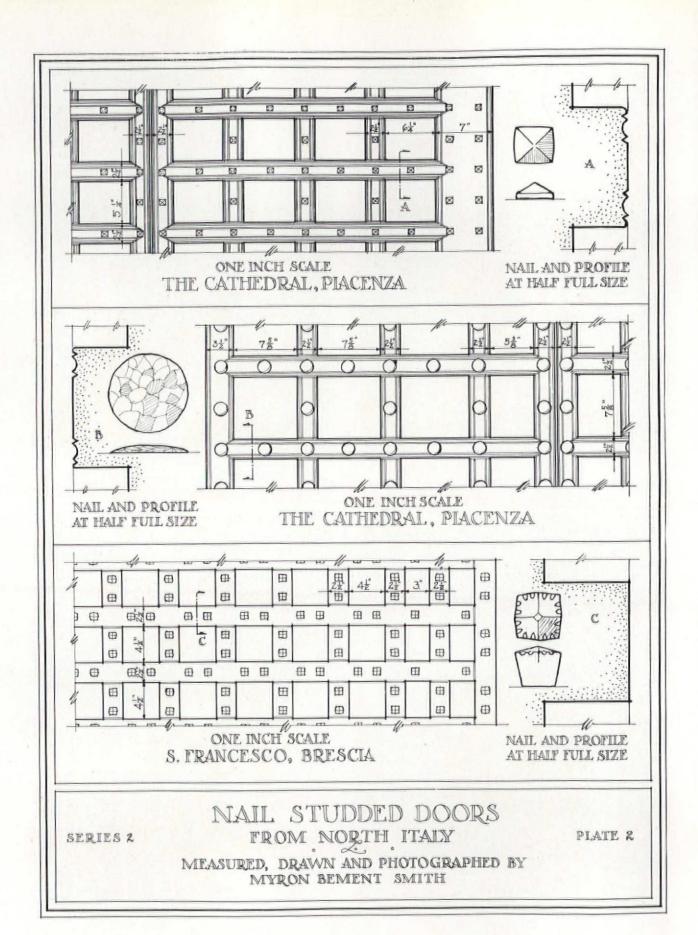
DETAIL OF RIGHT DOOR, THE CATHEDRAL, PIACENZA
